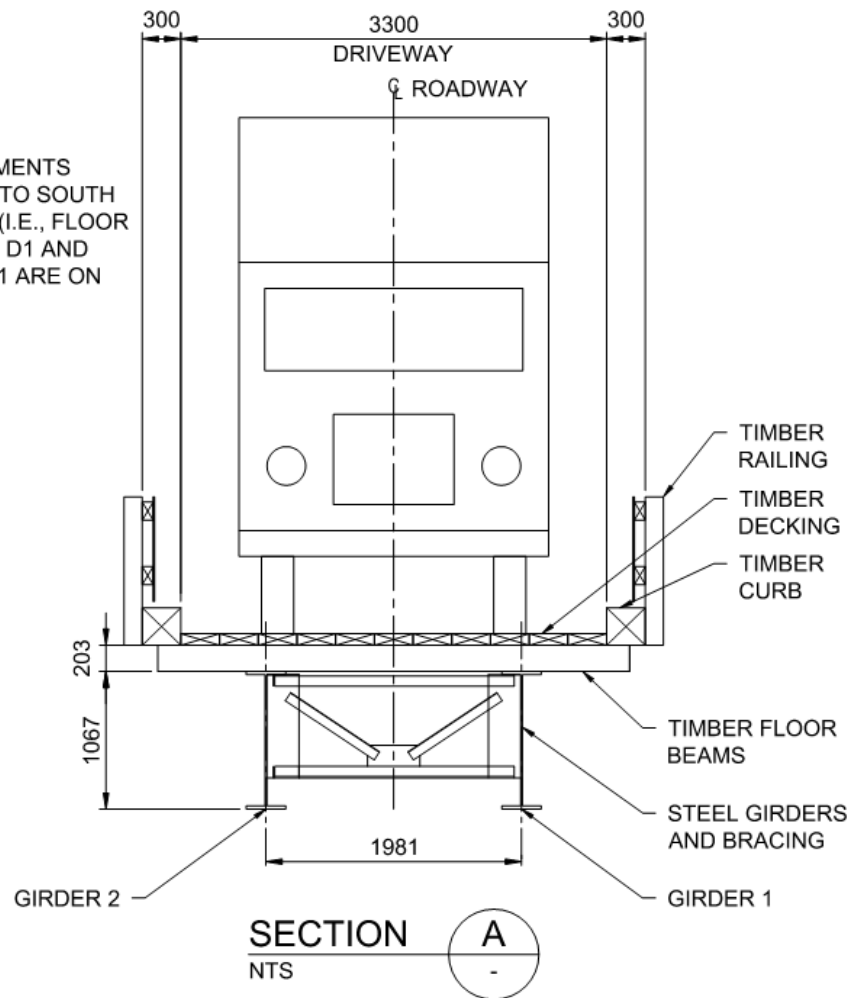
Bayview Road Bridge over Alberta Creek (Driveway) – Section
